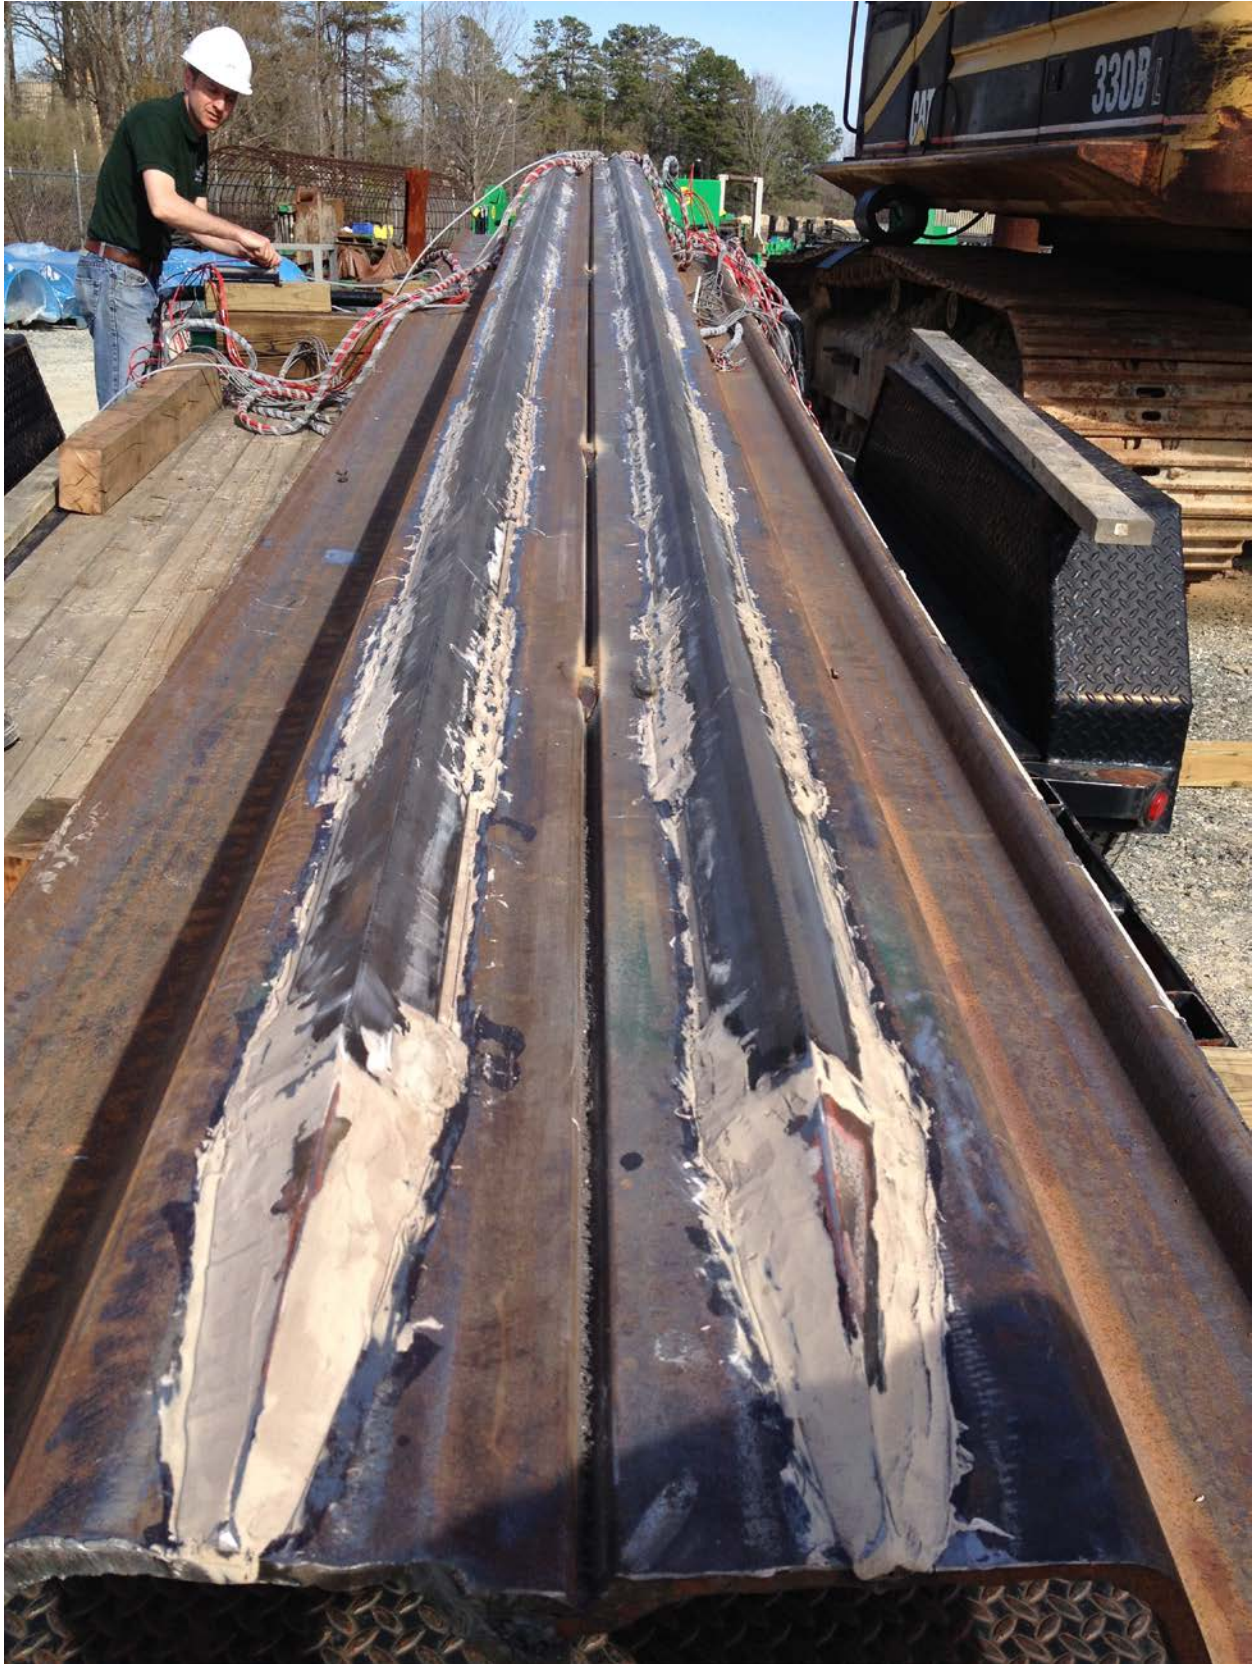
Photo of instrumented sheet pile wall for field load testing program.
